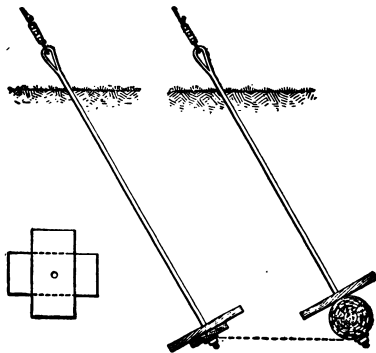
AERIAL LINE CONSTRUCTION, DEADMAN AND ANCHOR ROD.
